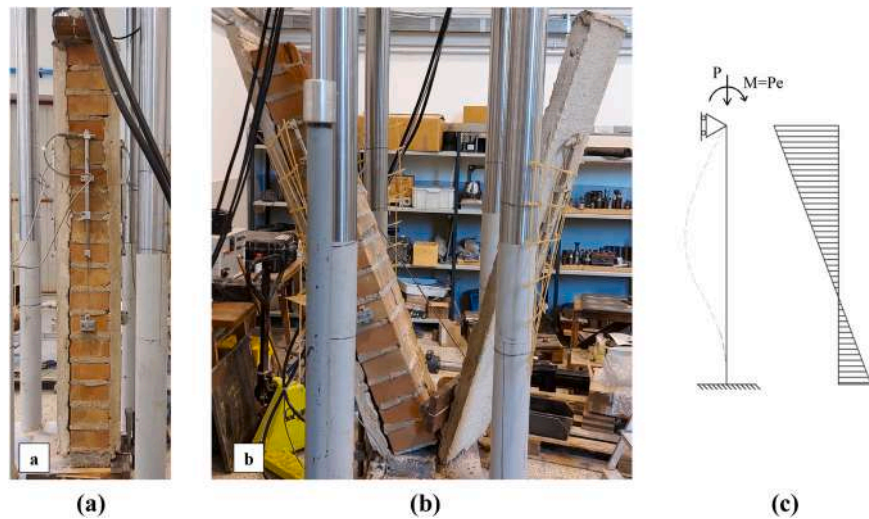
COMP_2_ecc: (a) detachment of the compressed CRM layer; (c) bending failure mechanism with final detachment; (c) static scheme of the panel eccentrically loaded.
